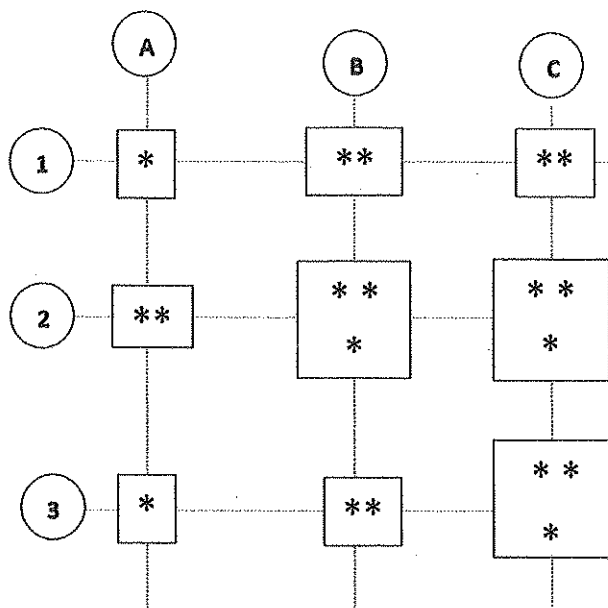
(c)/Rajah B3(c) : Layout plan of piling
